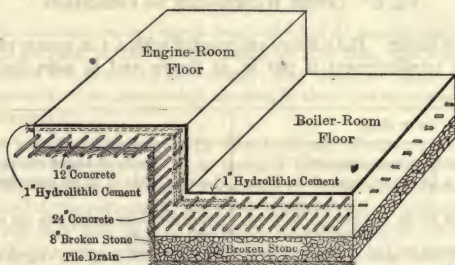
Reinforced-concrete Floor with Water-proof Cement
